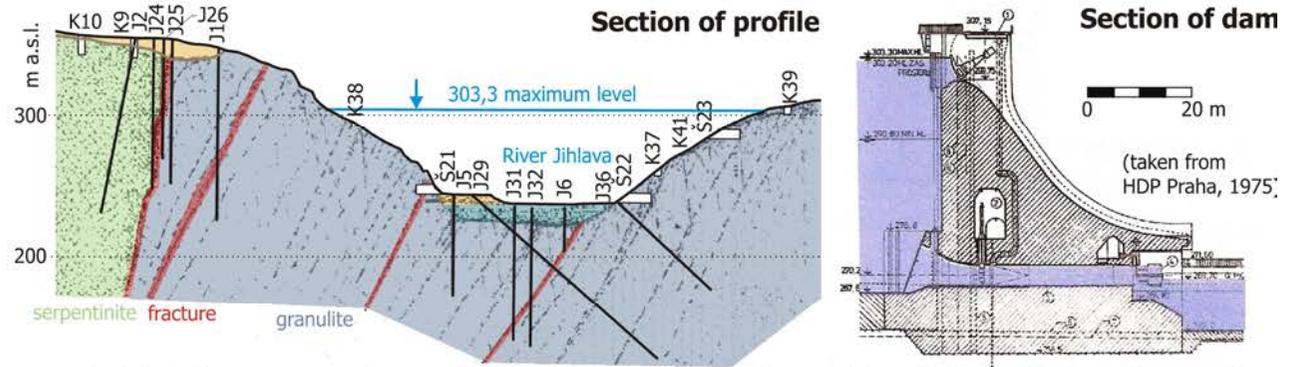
Schematic geological cross section along the profile of the Mohelno dam with a cross-section showing the structure of the concrete gravity dam and the penstock to channel water through the HEP turbines (after Krčma, 1975)
